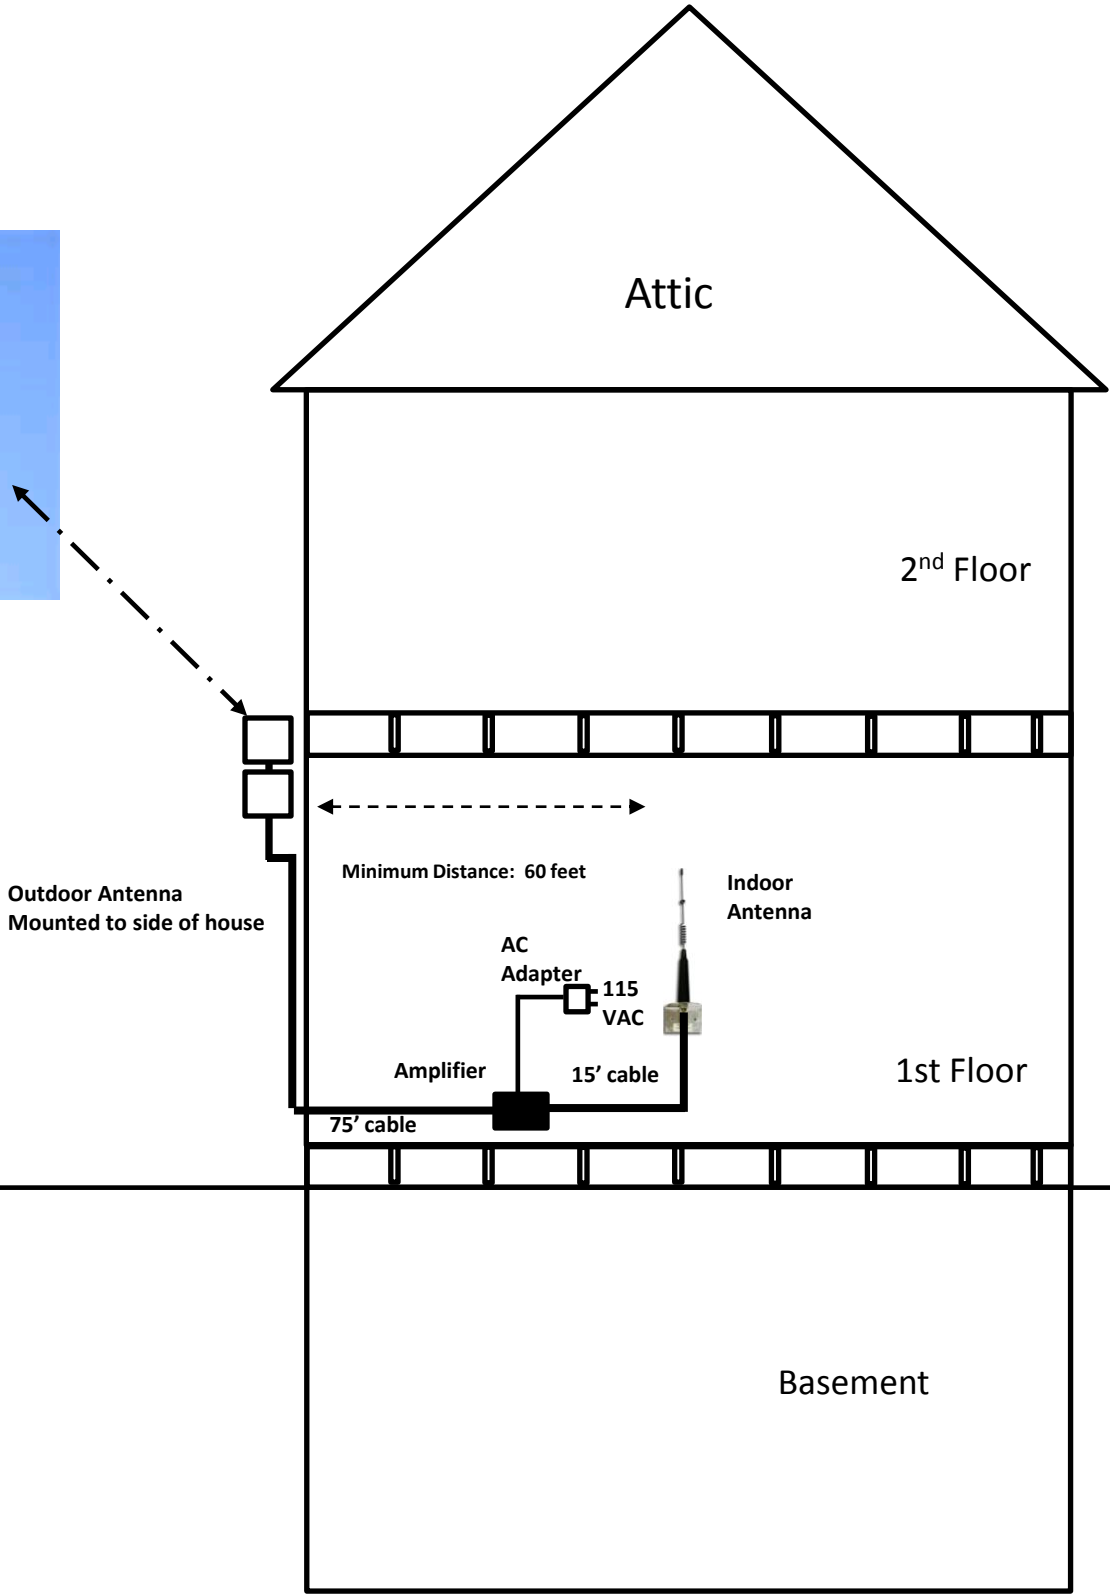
Typical Installation with outdoor antenna mounted to side of house
